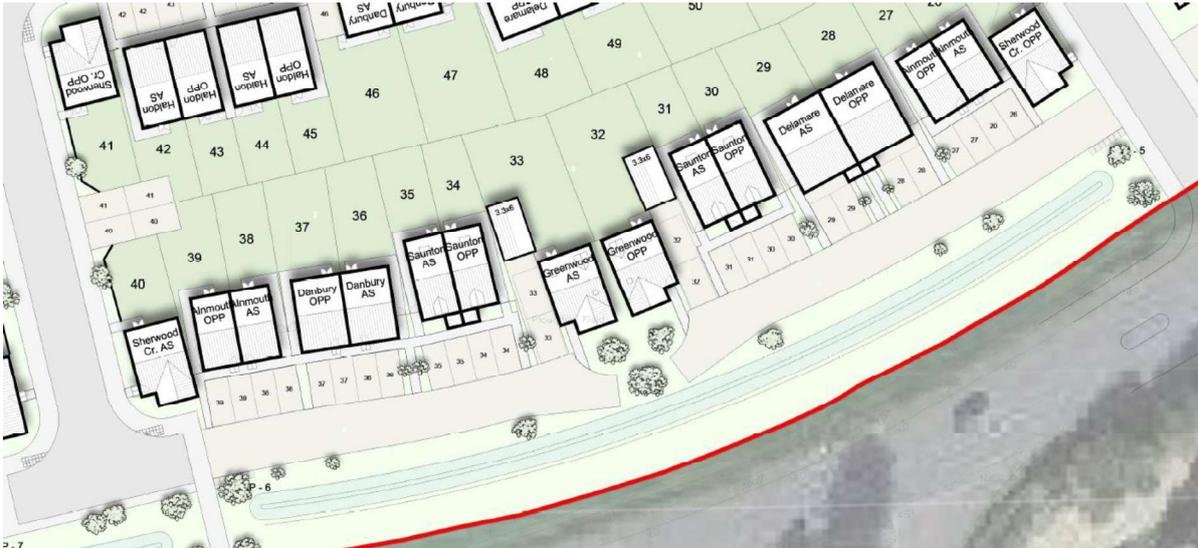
Private driveways on southern portion of site, adjacent to High Road
